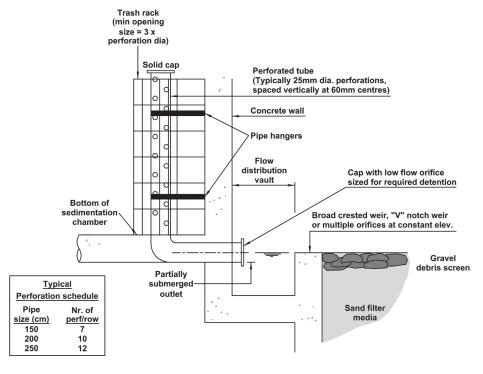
Typical sand filter inlet detail (adapted from Claytor and Schueler, 1996)
